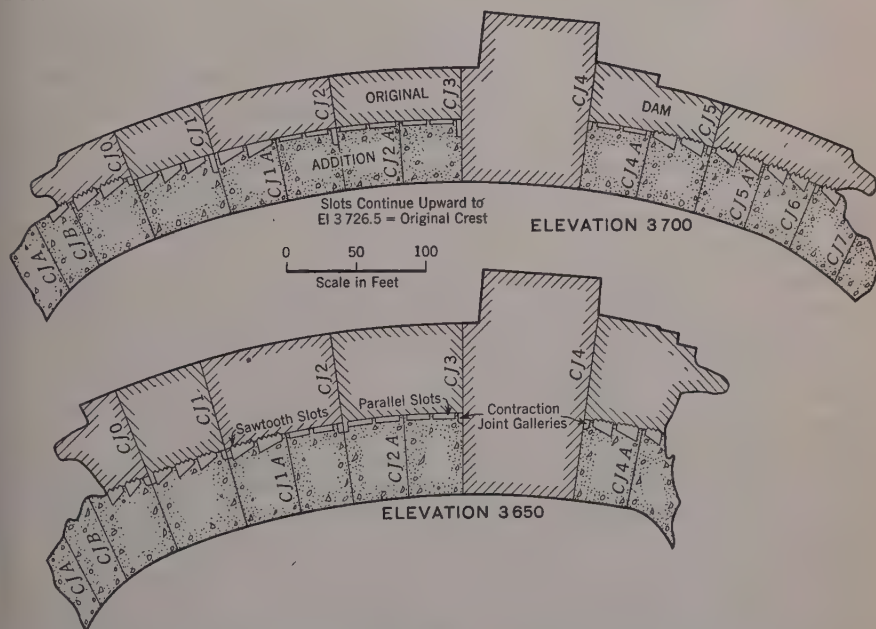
HORIZONTAL SECTIONS OF O'SHAUGHNESSY DAM AS ENLARGED, SHOWING ARRANGEMENT OF SLOTS ALONG LONGITUDINAL JOINT, AND OF RADIAL CONTRACTION JOINTS, 150 FT AND 200 FT ABOVE BASE OF ADDITION
